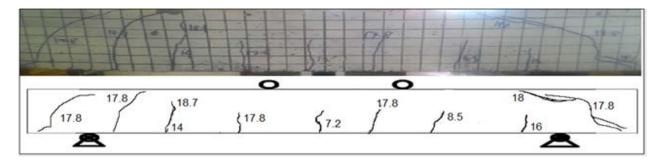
(c) - Cracking pattern of 20P10E beam specimen
